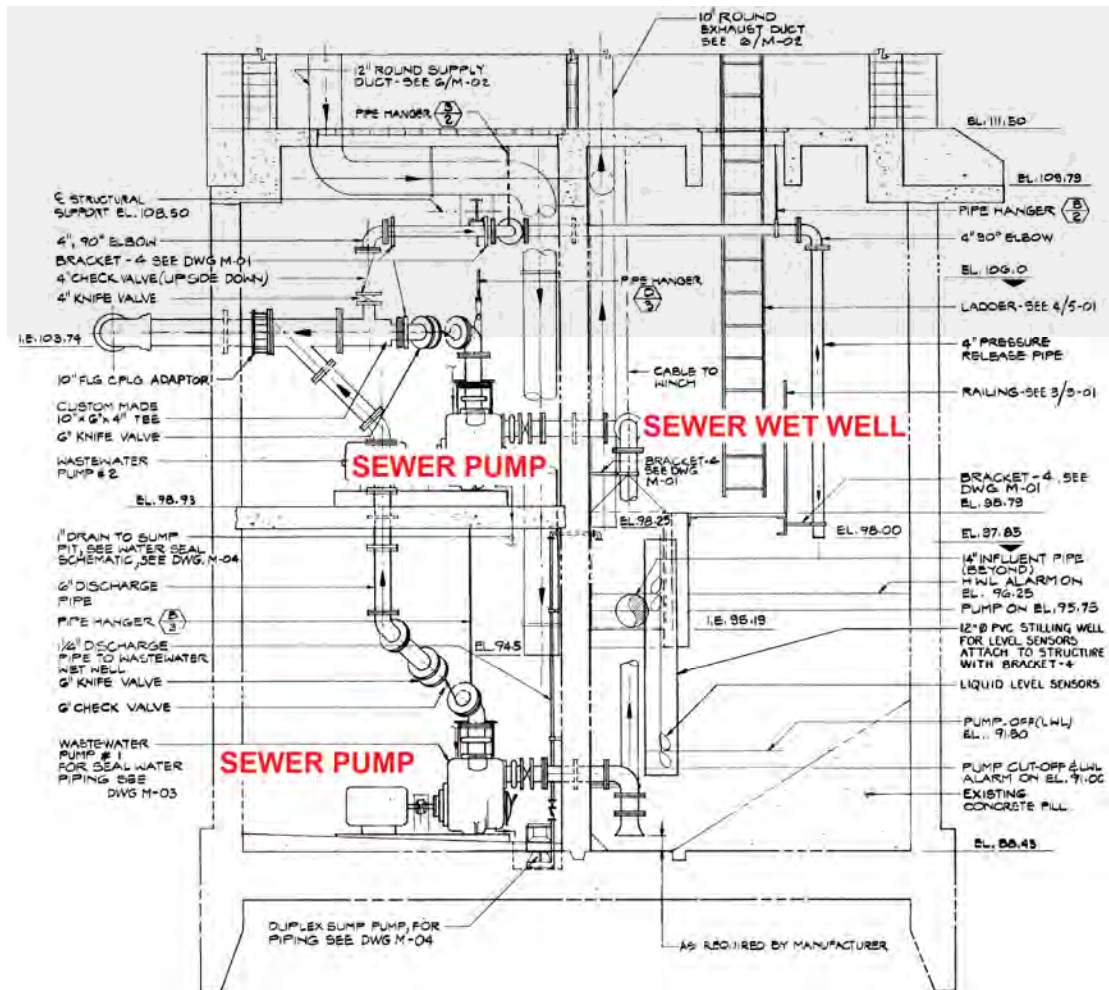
Cross Section of Queen Avenue Sewer Pump Station
